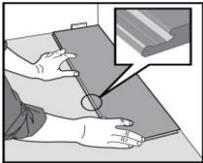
First plank, first row. Place a spacer of 12-15 mm thickness to the left and position the plank against the wall. Later, after 3 rows, you can easily position the flooring against the front wall with distances 12-15 mm.
